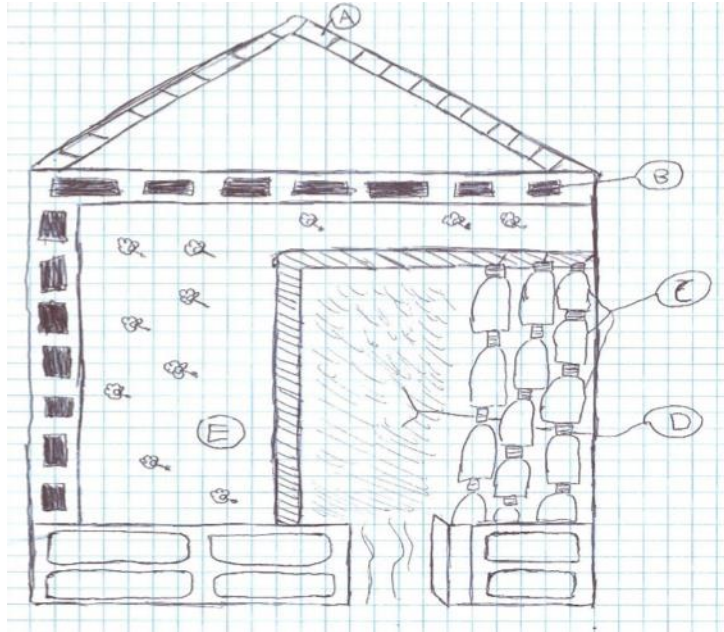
Layout of The Gremlinian Greenhouse; A: twin-wall acrylic; B: shelving; C: vertical garden; D: decomposed granite flooring; E: raised bed (Drawn by: Eric Herrera 10/11/2014)
